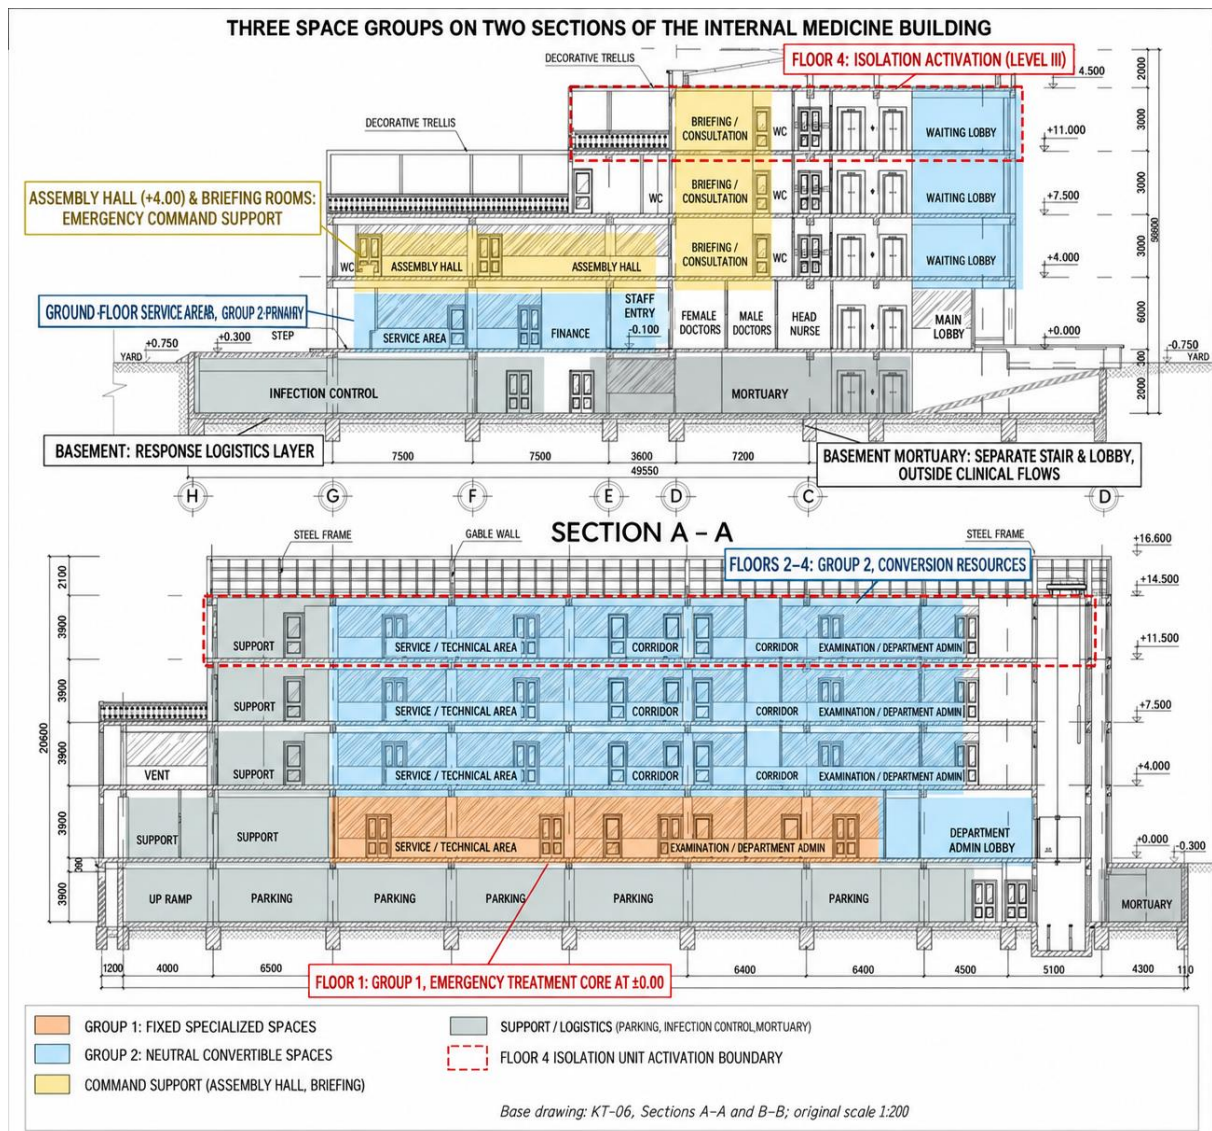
Three space groups on two sections of the Internal Medicine Building
